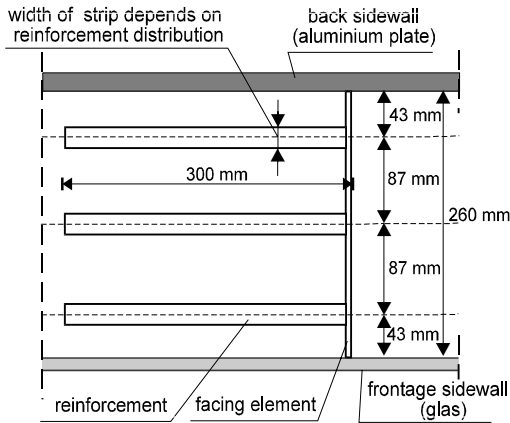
Arrangement of reinforcing strips in reinforcement layer.
